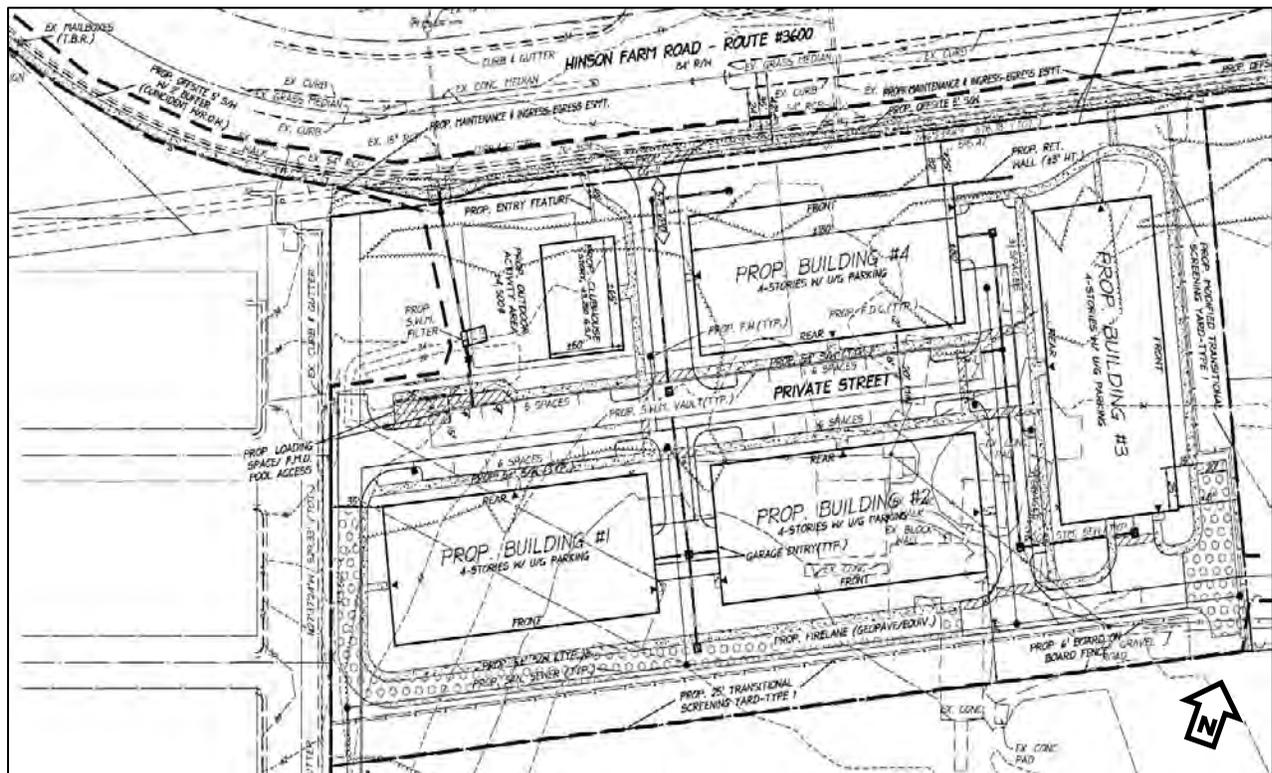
Site Layout; Source: GDP/SE Plat, Page 5
